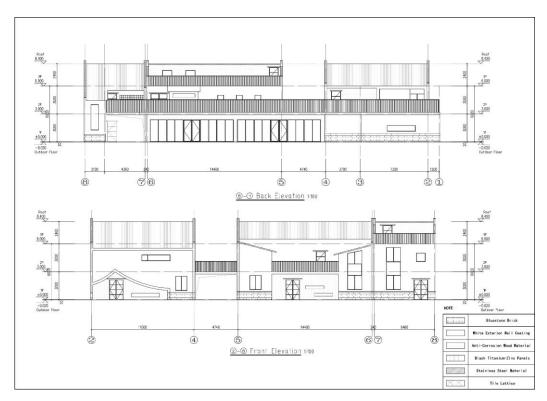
The Back Elevation and Front Elevation of Building Complex (Drawn by the author)
